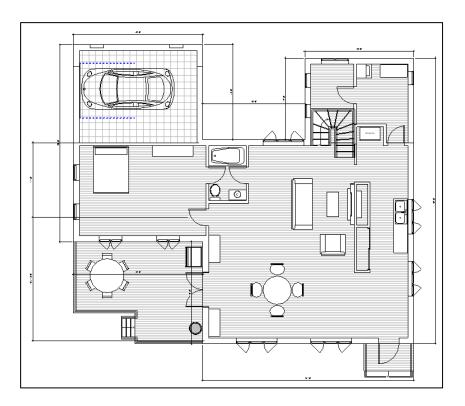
Proposed 50 Wolbach Road Ground Floor Plan
